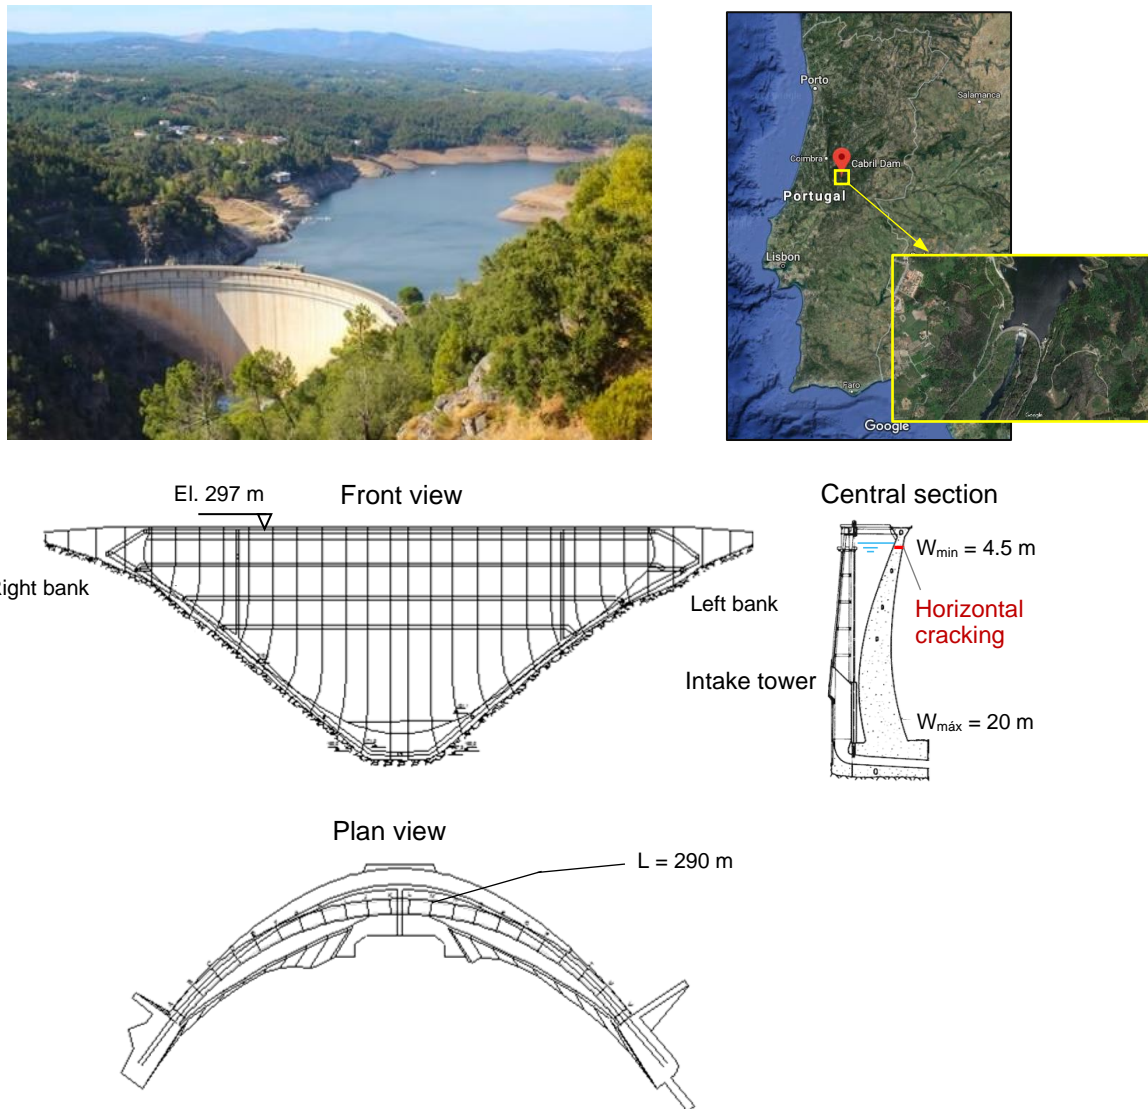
Cabril arch dam (132 m high). Upstream view, central cantilever and top view.
